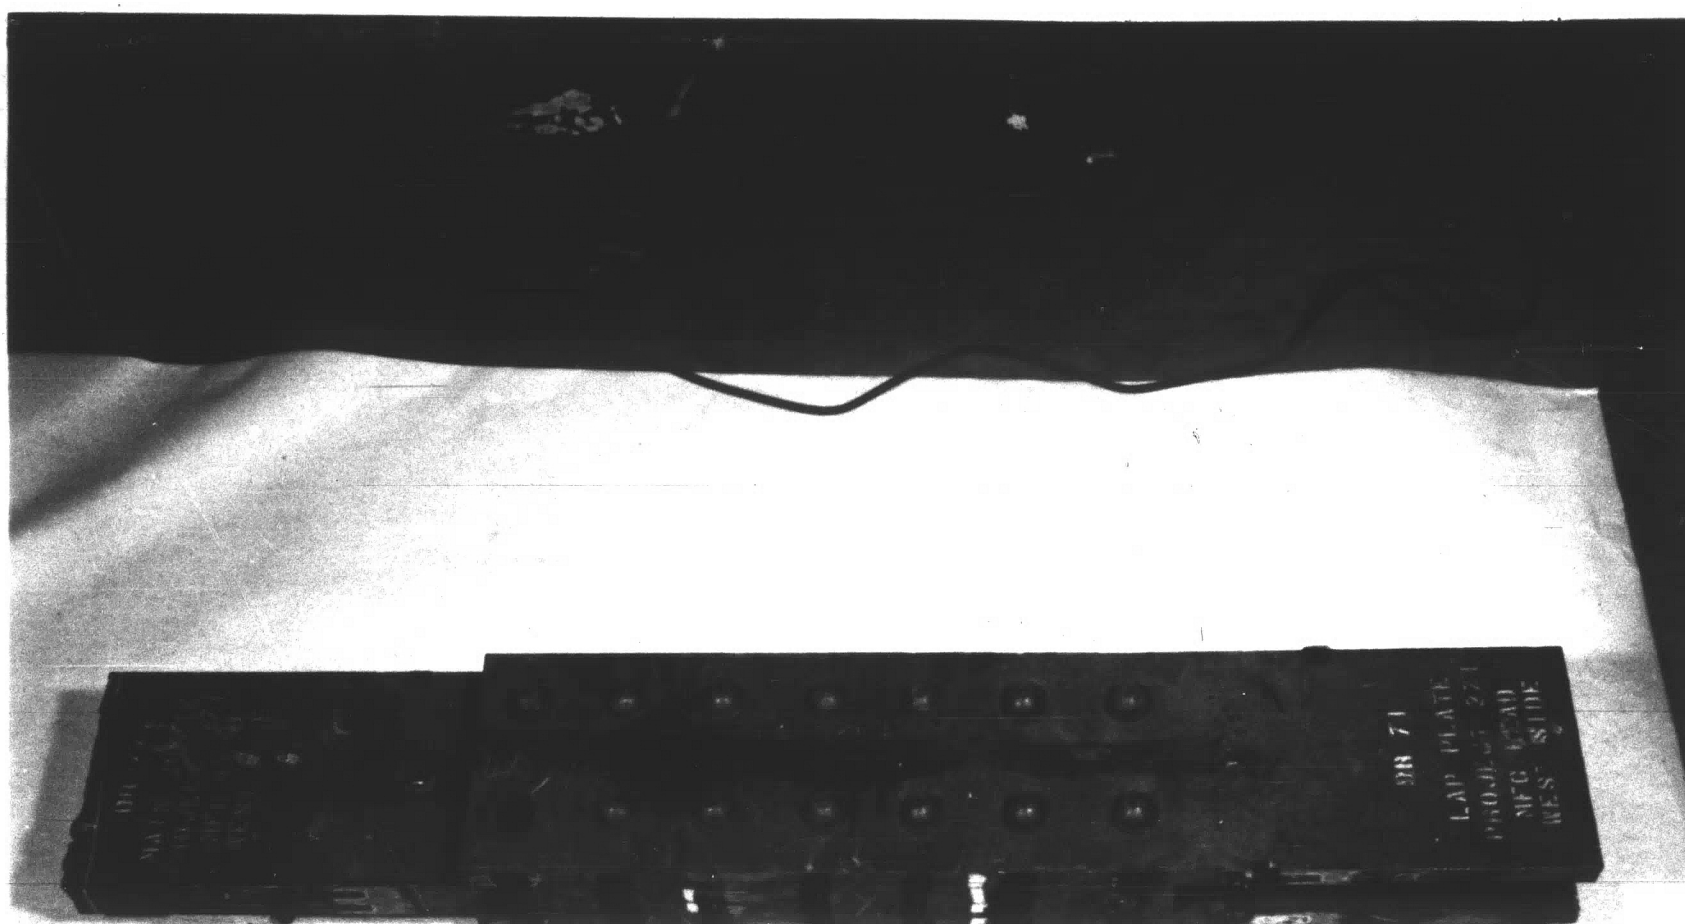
JOINT DR 71 WITH TOP RIVET SHEARED
